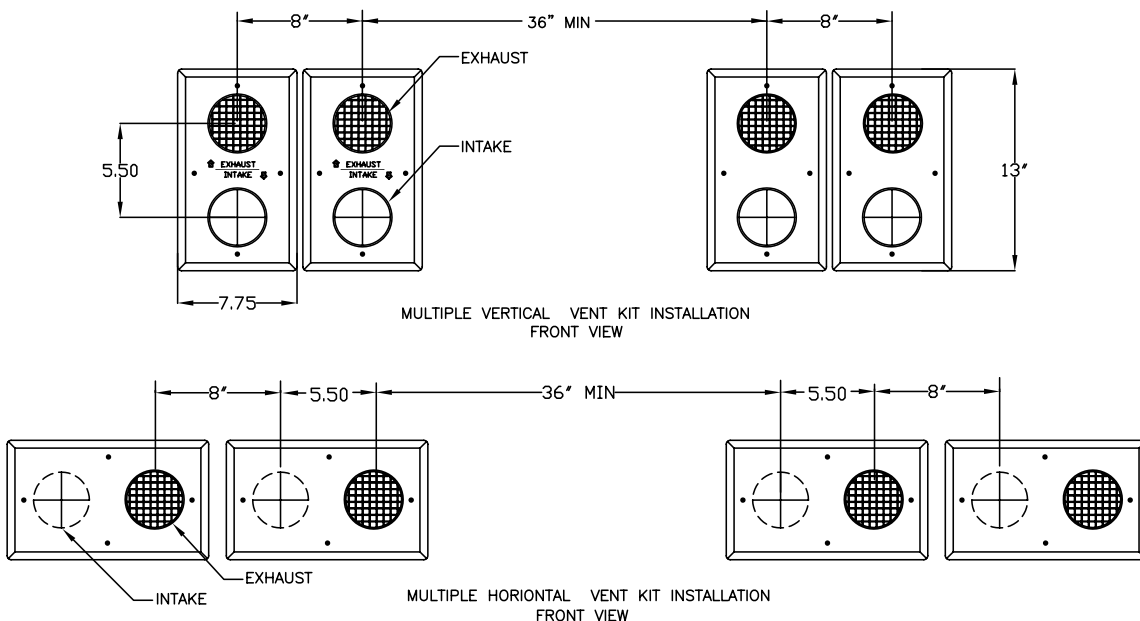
Multiple Stainless Steel Horizontal Vent Kit Installation – Front View
